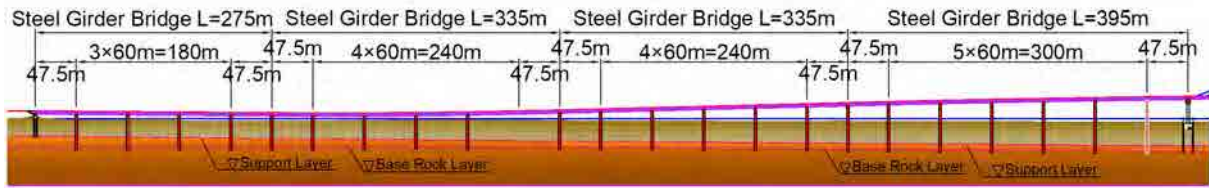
Layout of the Left Bank Approach Bridge (Route3)
